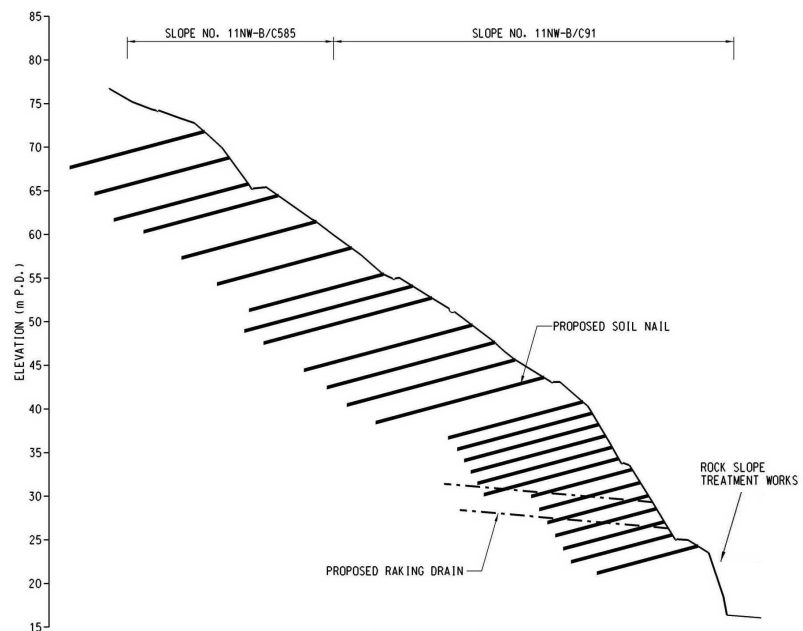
Typical Section Showing Upgrading Works on Slopes C91 and C585
